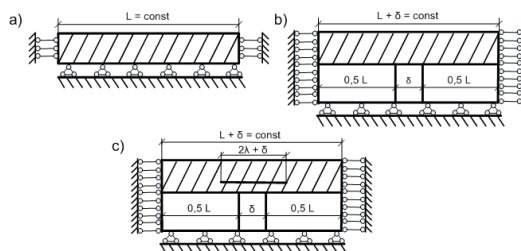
Design models for the calculation of stresses in asphalt concrete pavement before cracking:
